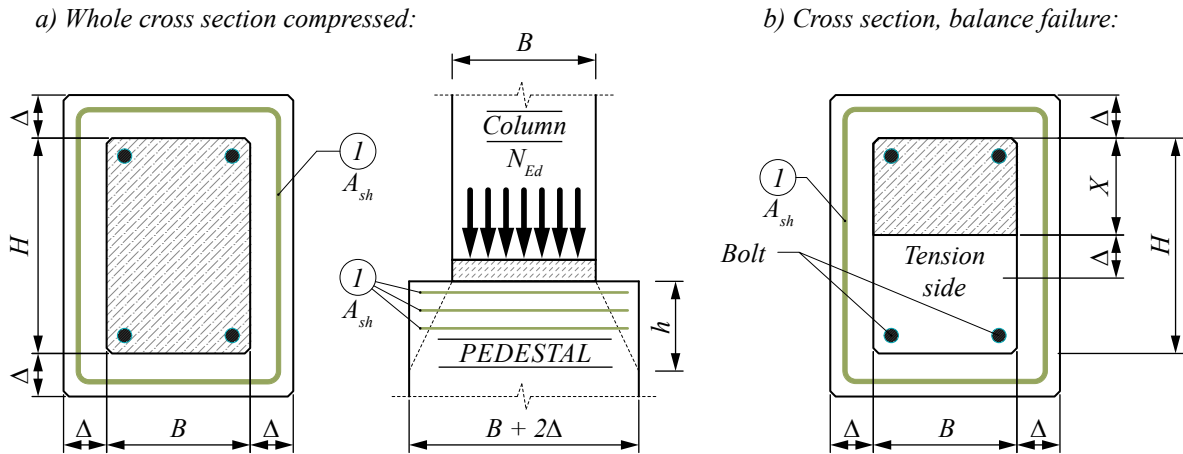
Column connection with two different size sections. Splitting reinforcement in base column.
